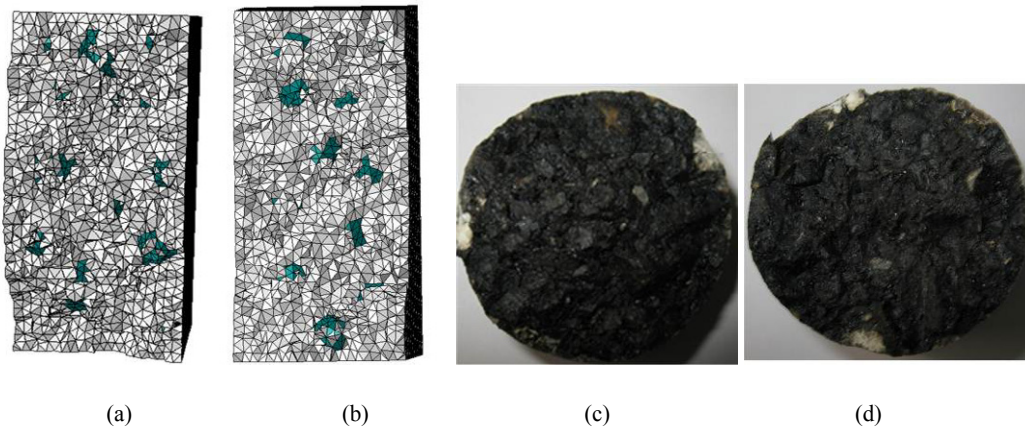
Fracture surfaces of a numerical specimen and an experimental specimen
